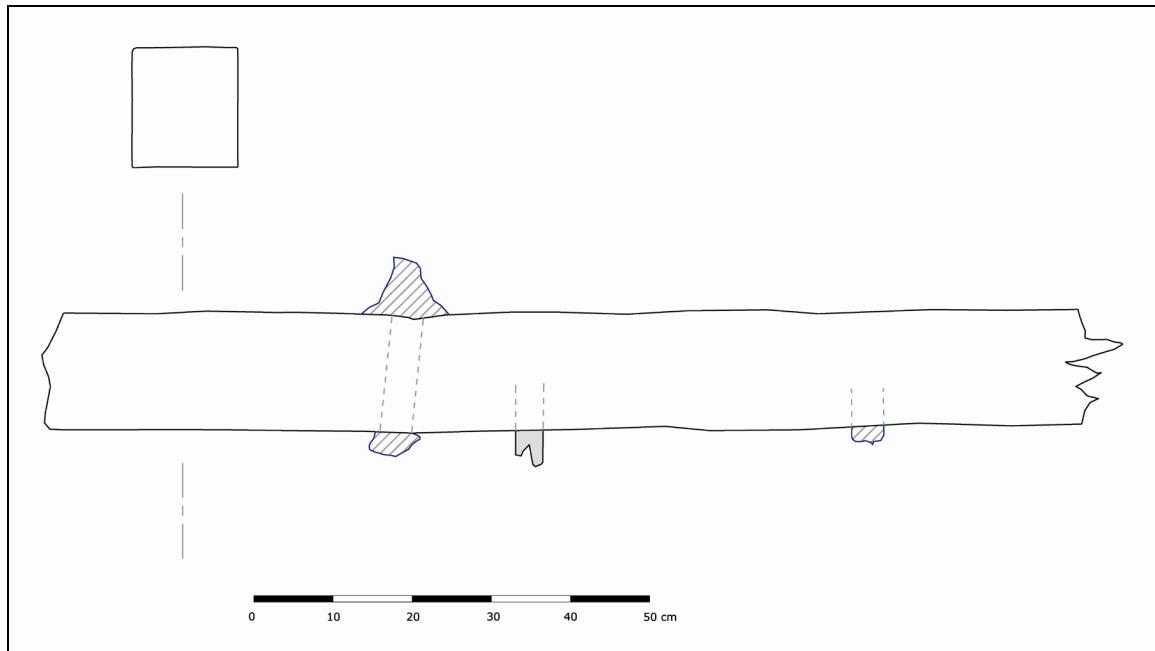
CE2 a beam with iron bolts and treenail fastenings
